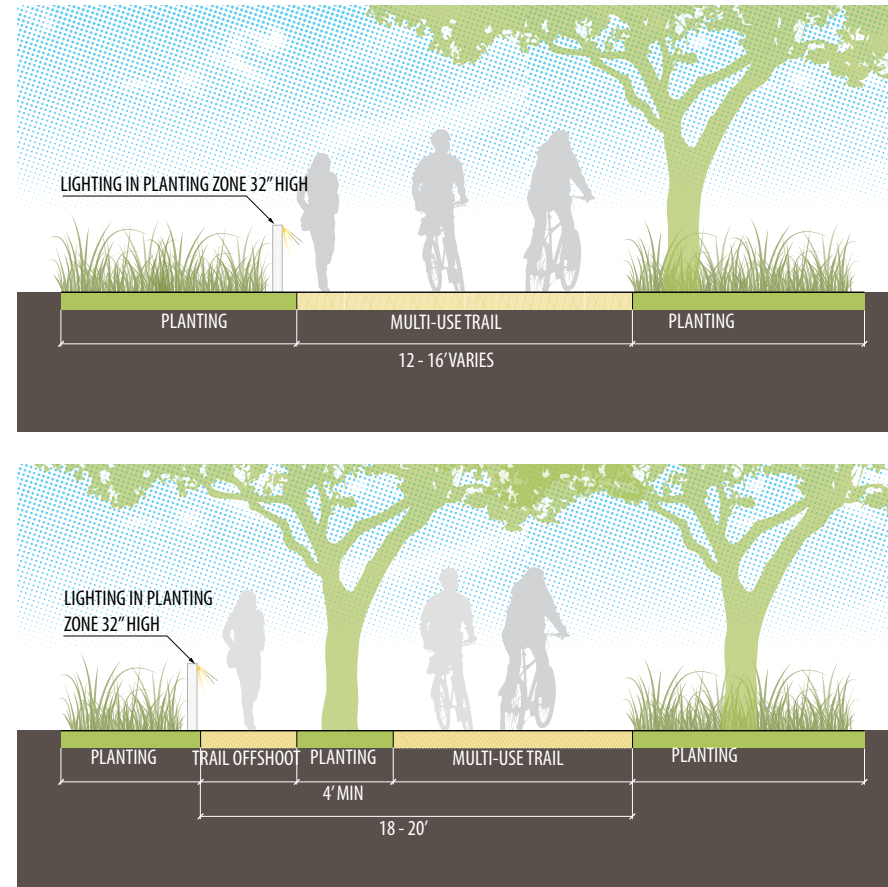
TRAIL SECTIONS - MULTI-USE TRAIL
